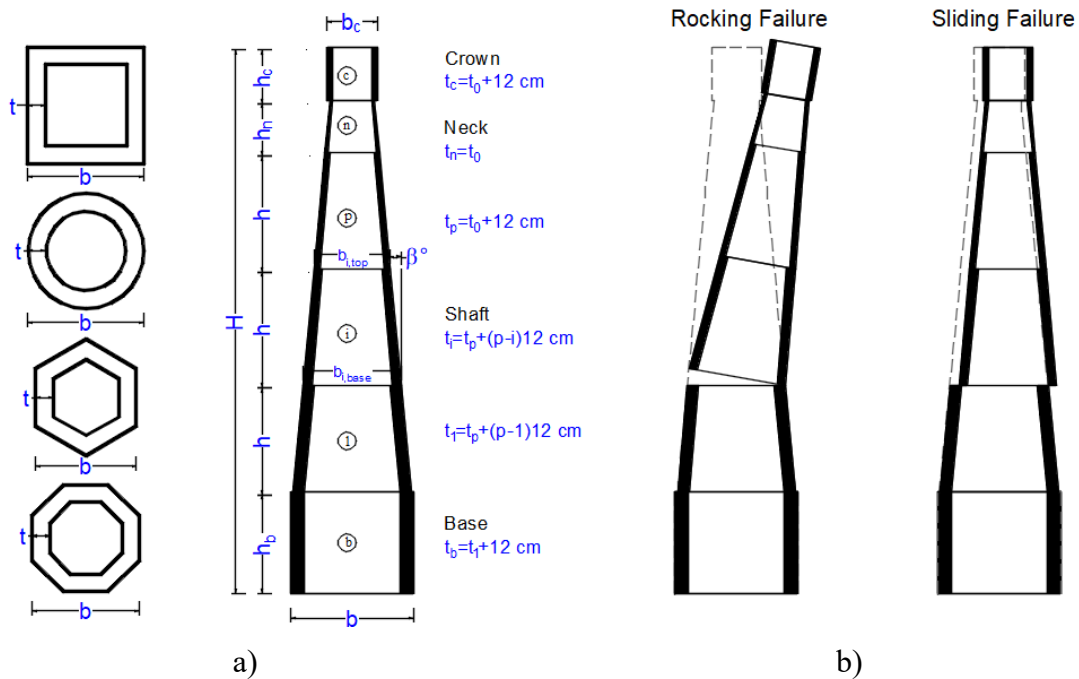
a) The simplified geometry of a masonry chimney, b) Two typical failure mechanisms.
